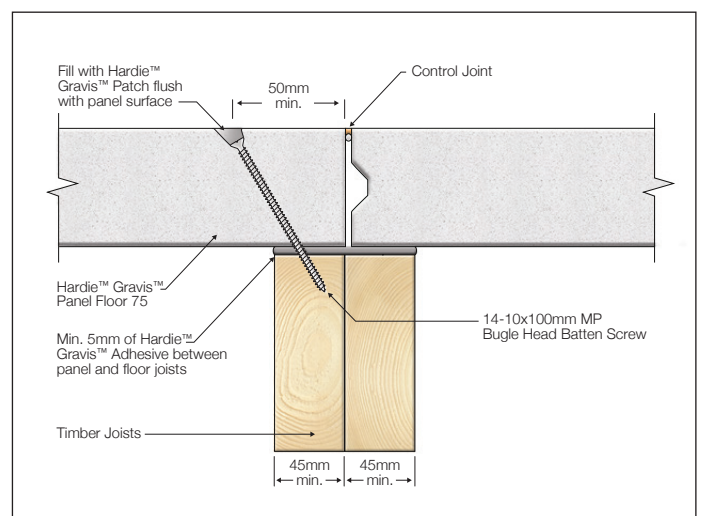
FIXING AT END PANELS TO TIMBER JOISTS
